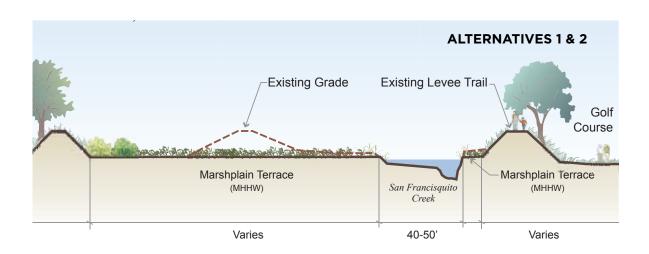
| CROSS SECTION C, VIEW LOOKING DOWNTREAM
